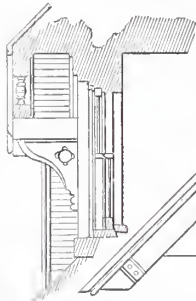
Section of Gutter and Cornice on Wing.—Scale, $\frac{3}{8}$ Inch to the Foot.
